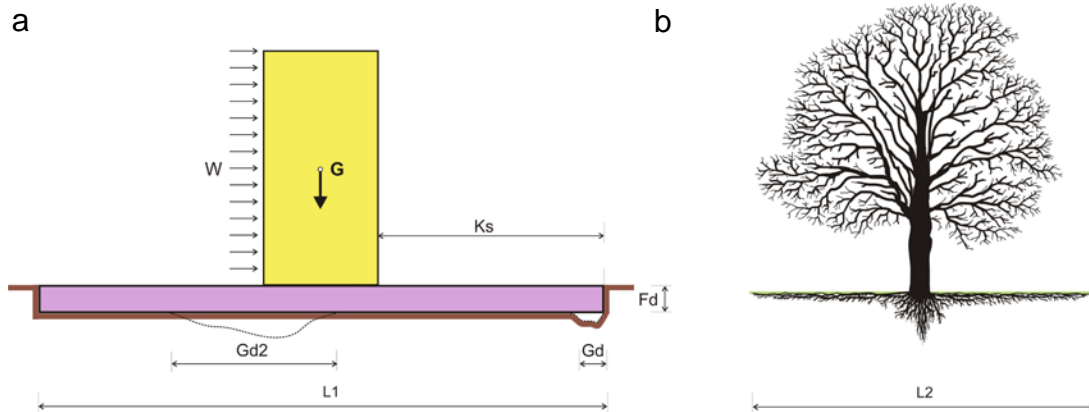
Analytic scheme of vertical cross section of building having very large form of shallow foundation and similar scheme of tree structure together with its root system
